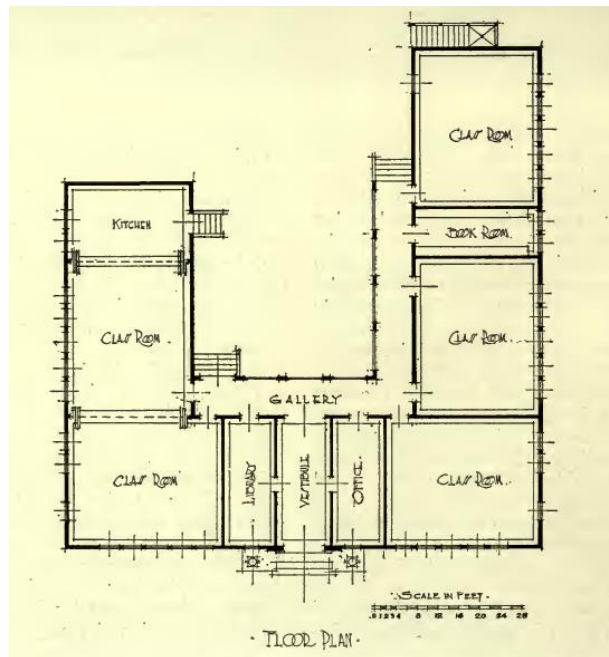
Finlayson’s floor plan.<sup>1</sup>
